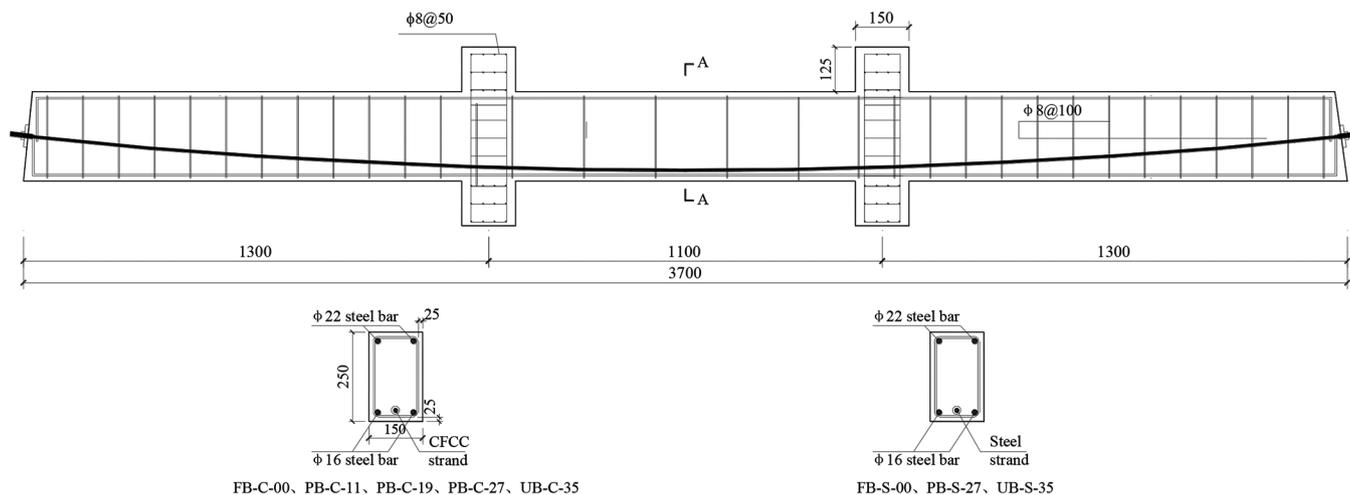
Dimensions and reinforcement details of test specimens. (Note: Units in mm; 1 mm = 0.0394 in.)
